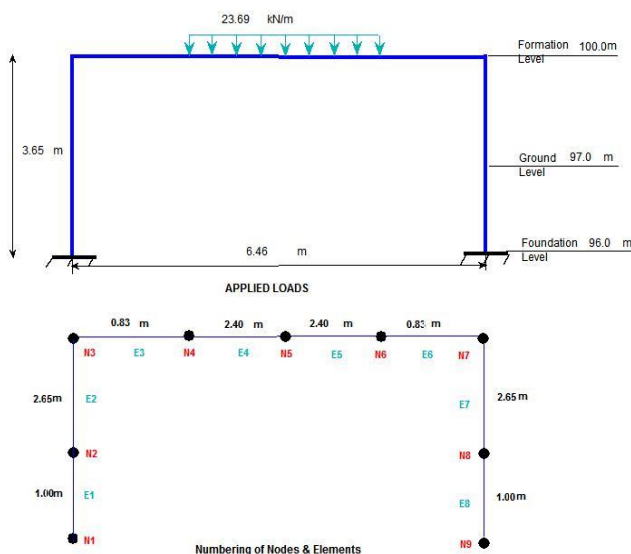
Part-2 analysis in GUI for “Solid Deck Slab Bridge”.
